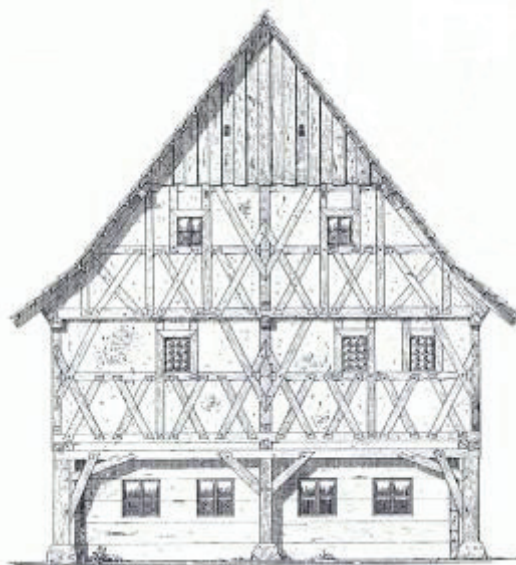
Non-existent building with umgebinde construction and knee wall in Struga. Facade. Edited by author,
